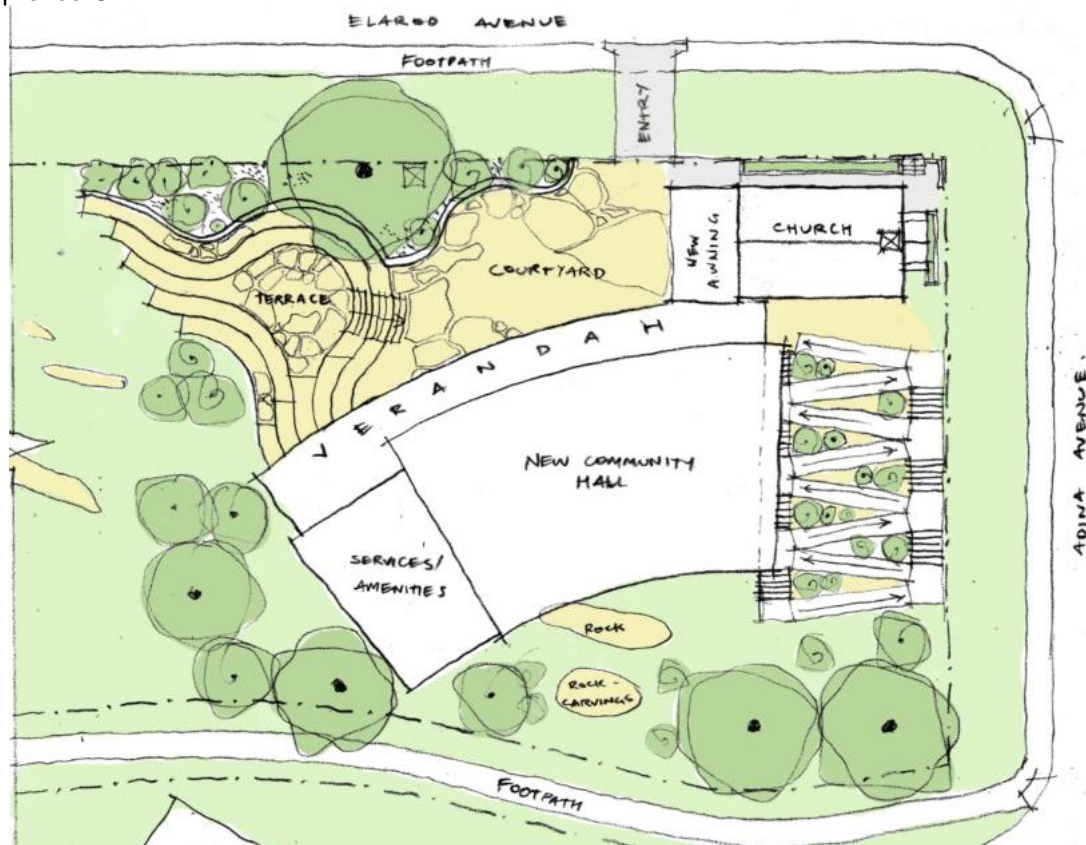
Concept Plan for the Subject Site – Source Stage 3 Concept Plan, Design 5 Architects.
